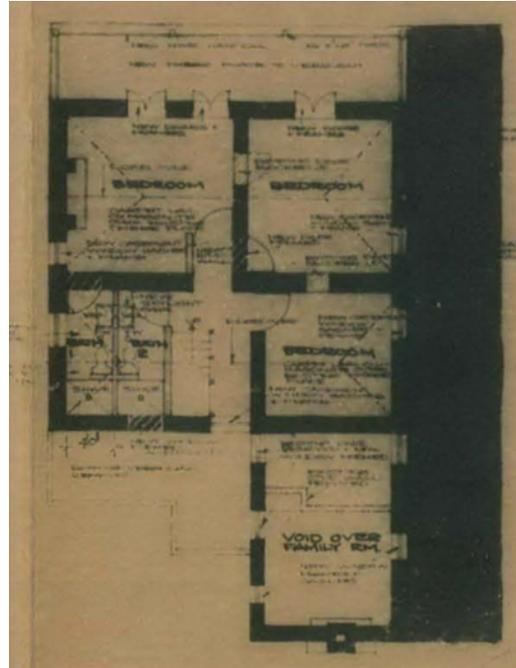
, First floor plan, Ian McKay Philip Cox, 08.01.1968
